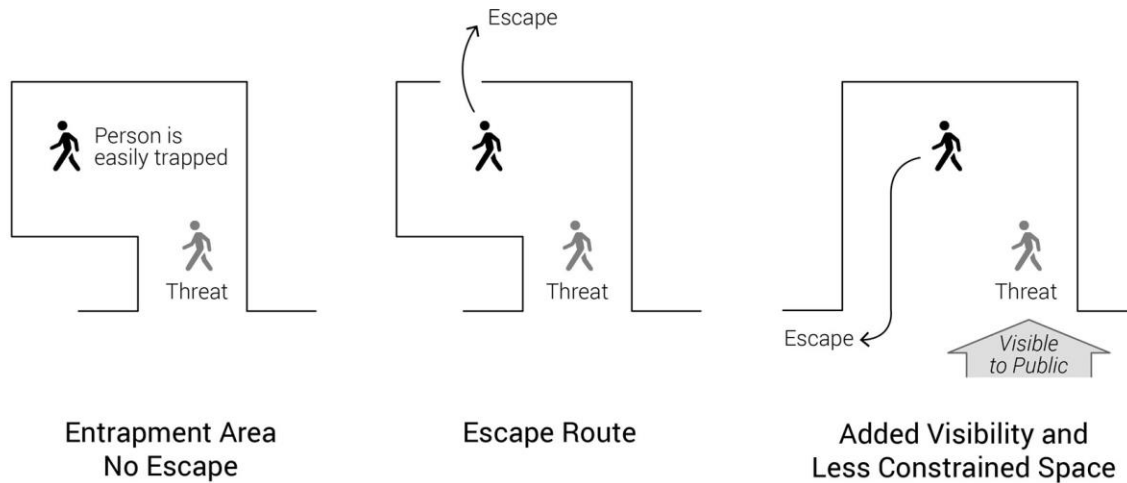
(6)(a)(i). Site and building design should avoid entrapment areas.
